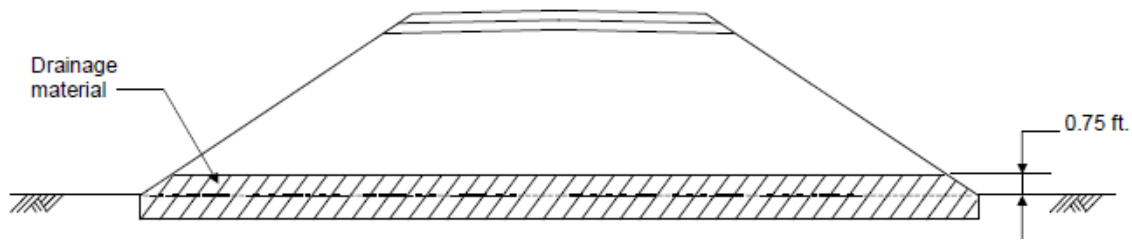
Drainage Layer under Embankments in Wet Locations [23]
